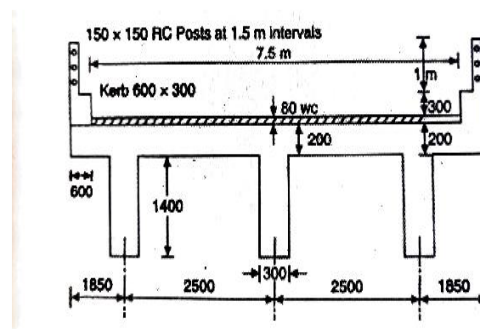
Elevation of Bridge given in Krishnaraju text book
